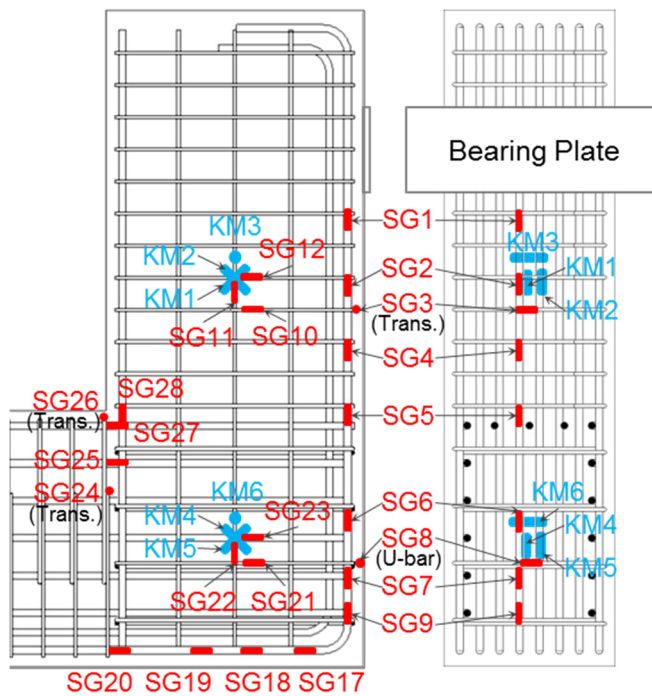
Experimental Setup for Specimen 3: Plan and Front Elevation View.
